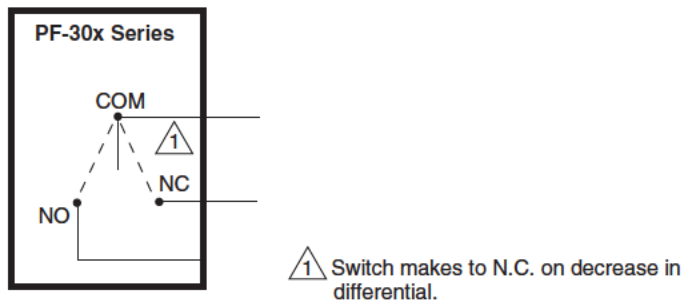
Switch Action and Typical Connections for PF-305 Switch.
